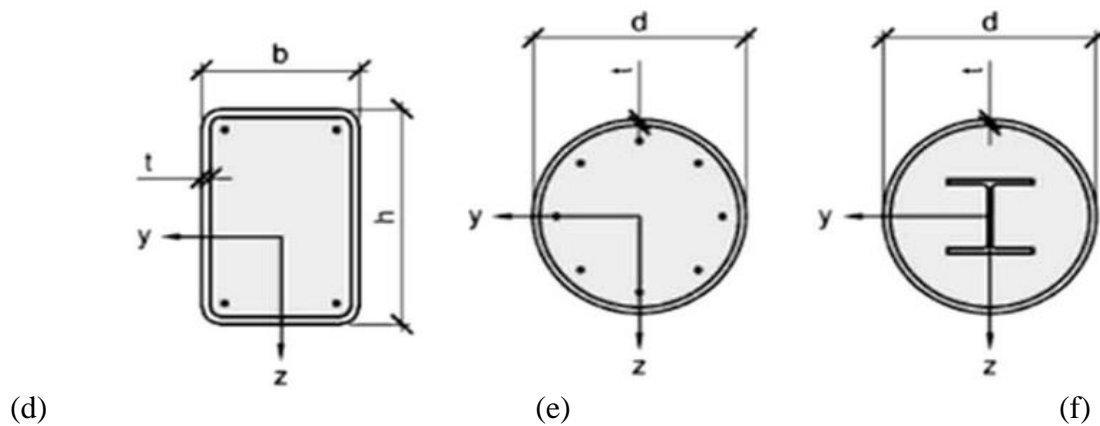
Typical Cross-Section of Composite Columns with Concrete-Filled Hollow Section (Source: ETHIOPIAN STANDARDS, ES EN 1994-1-1:2015)
